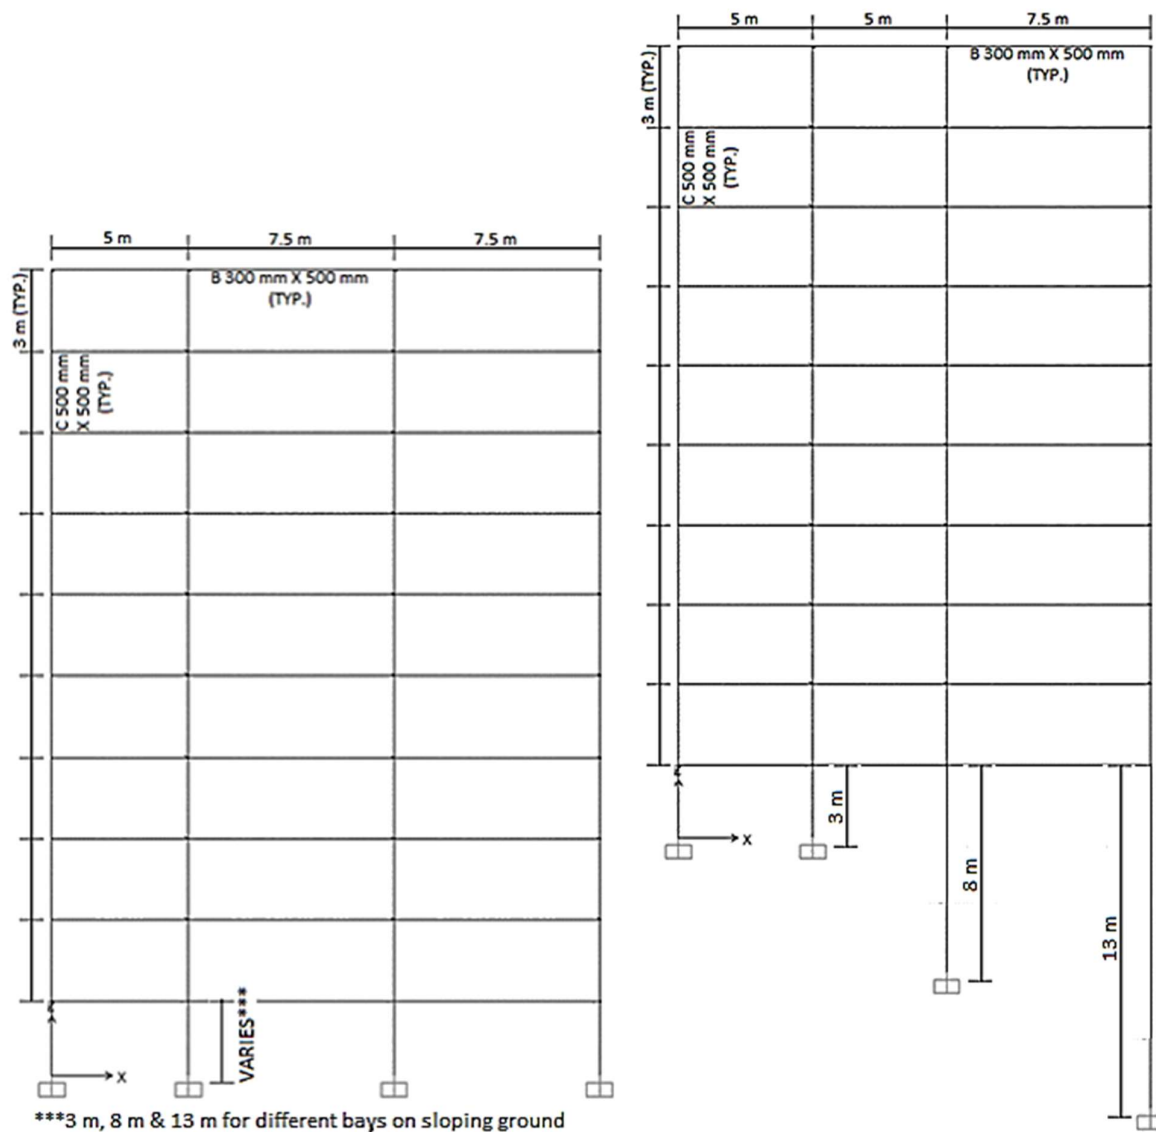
Elevation of the building without irregularity on sloping ground as well as elevation of the building with horizontal irregularity on sloping ground
